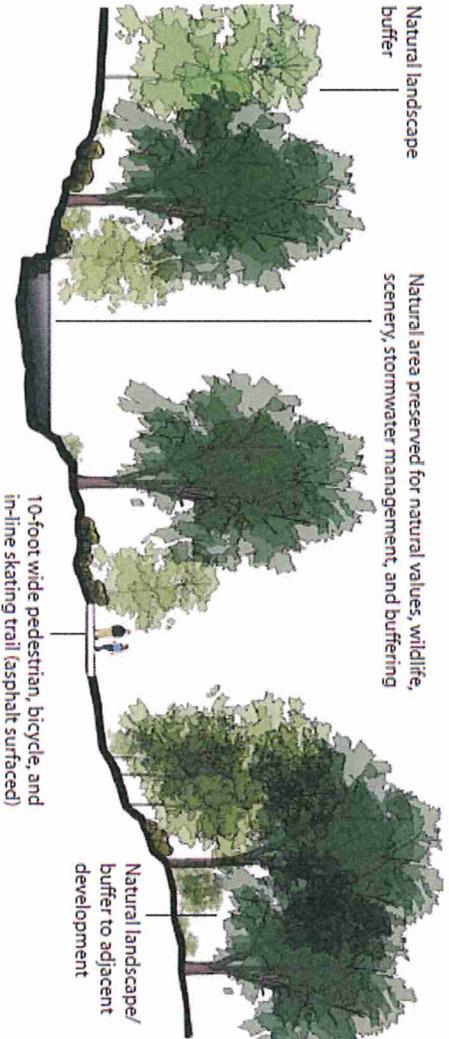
TRAIL AND BIKEWAY PLAN (SOURCE: CARVER COUNTY)
